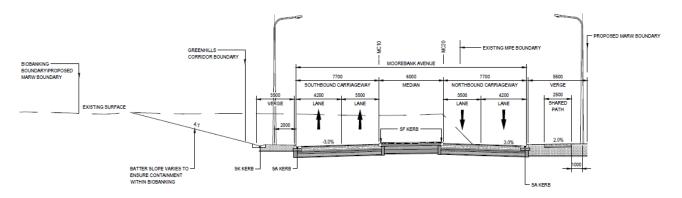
Indicative typical cross-section of alignment between Intersection C and Intersection D
